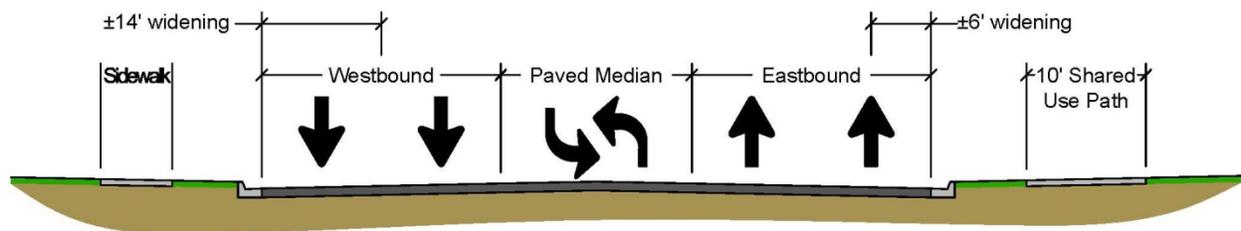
Option #2 – Proposed Kimball Avenue Typical Cross Section (Paved Median)
